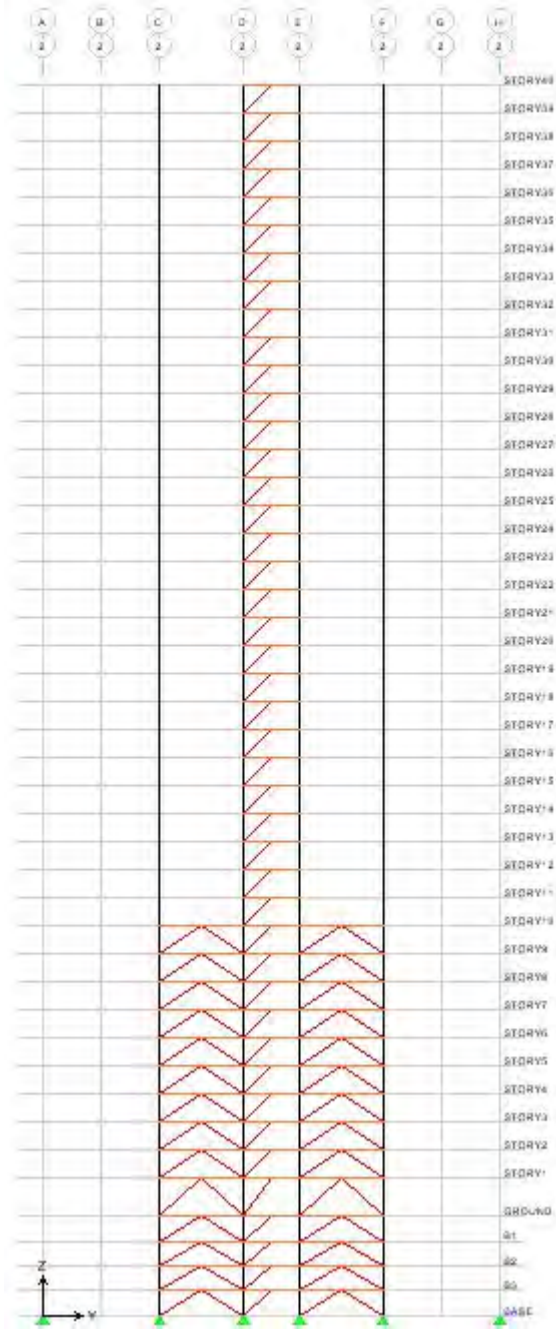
Elevation of Frame Along Line 2 Following Removal of a Brace
